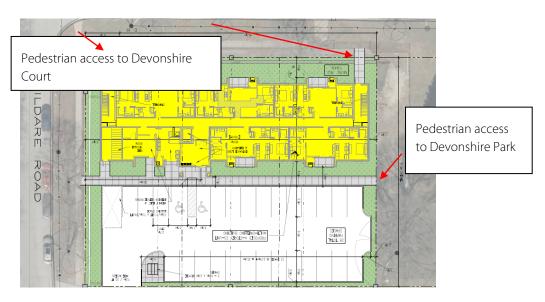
& 21: Aerial view of the former St. George's Church complex in 2017; (Source: Google Maps, 2021); Coloured site plan of proposed development to compare building footprint of Devonshire Court (Source: ADA Inc. Architect, 2021).
